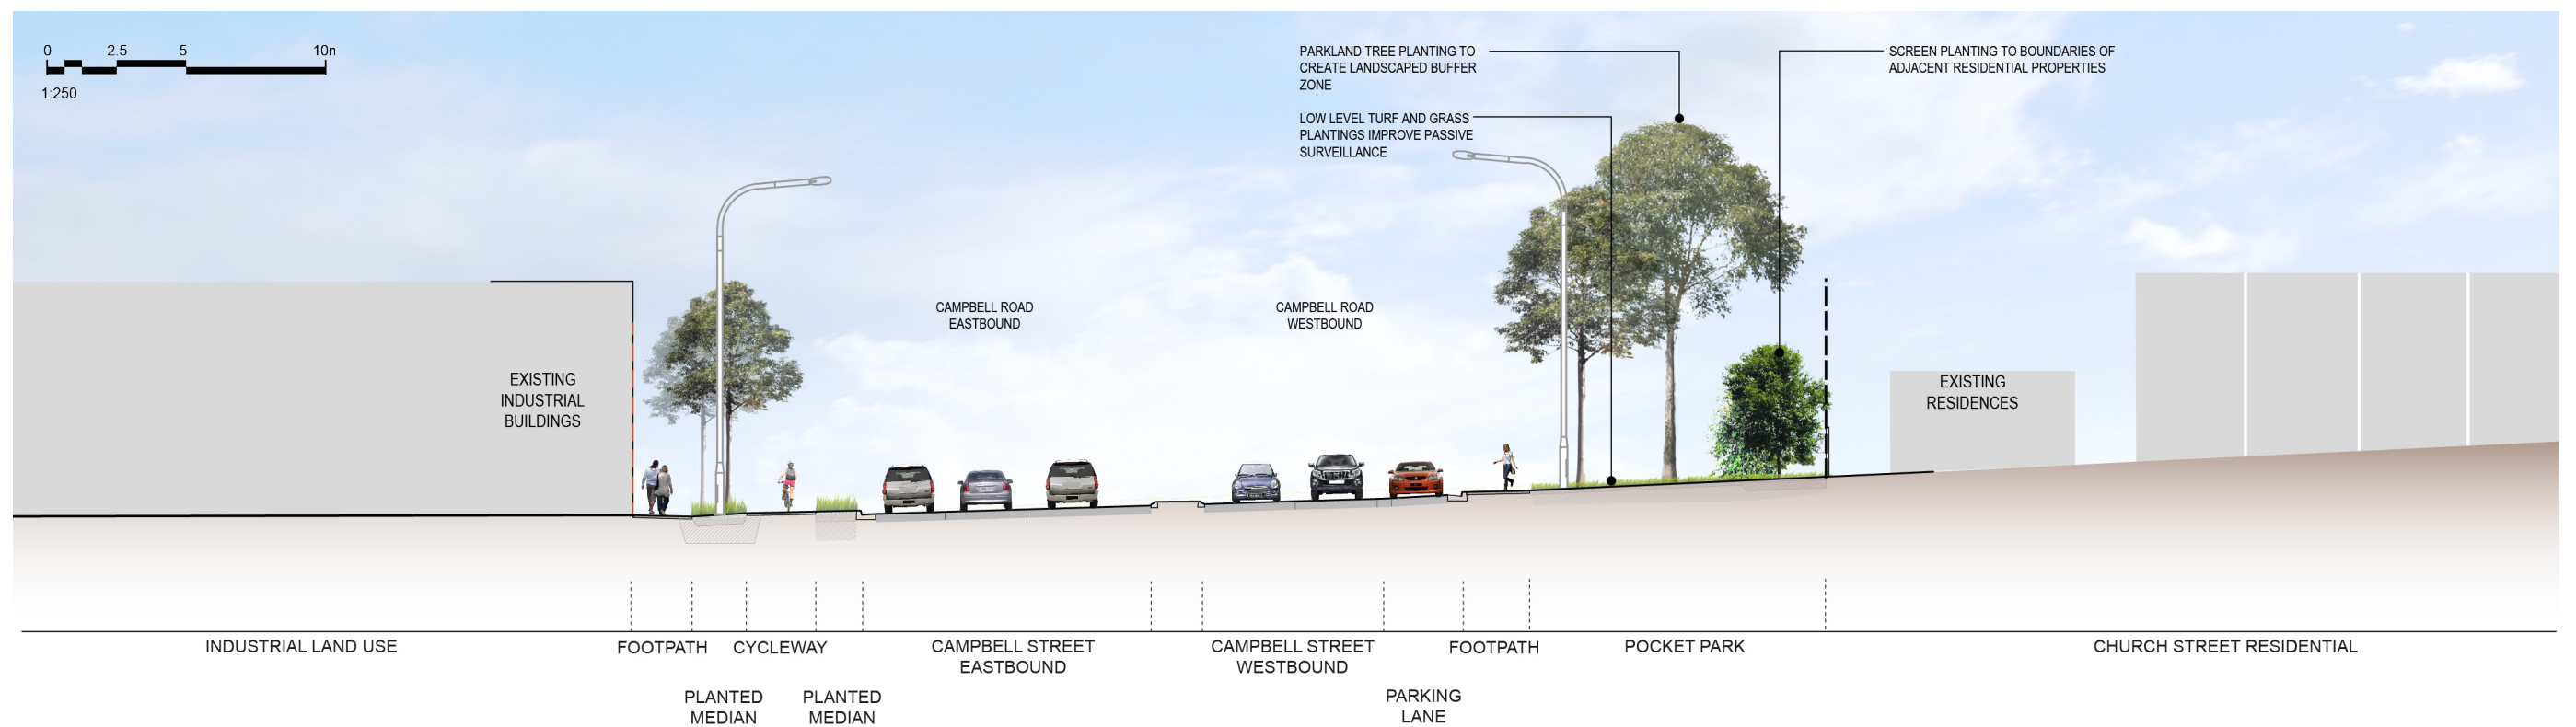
Typical Cross Section - Campbell Street - 1:250
